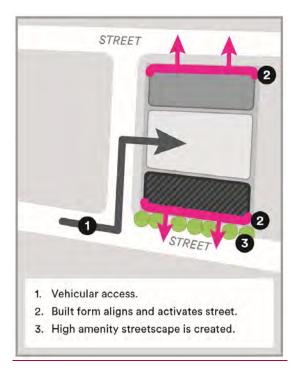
U Example of acceptable single frontage site treatment (parking)
